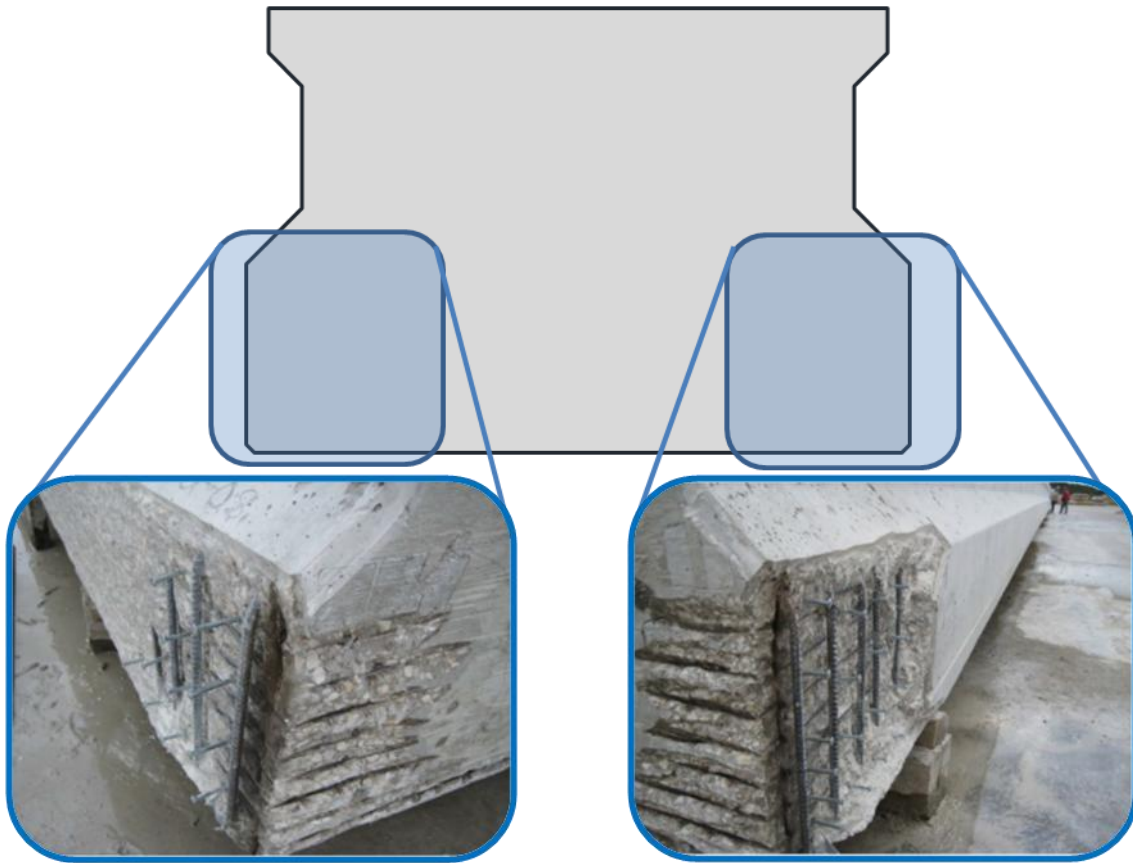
Spalling of concrete cover immediately after prestress transfer
